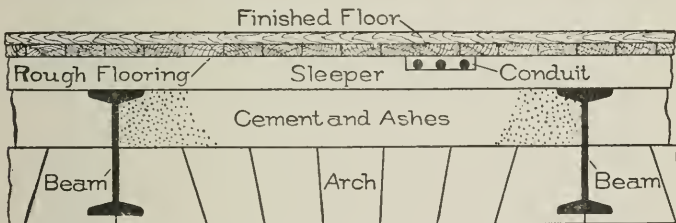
Running Conductors Concealed Under Floor in Fireproof Building
